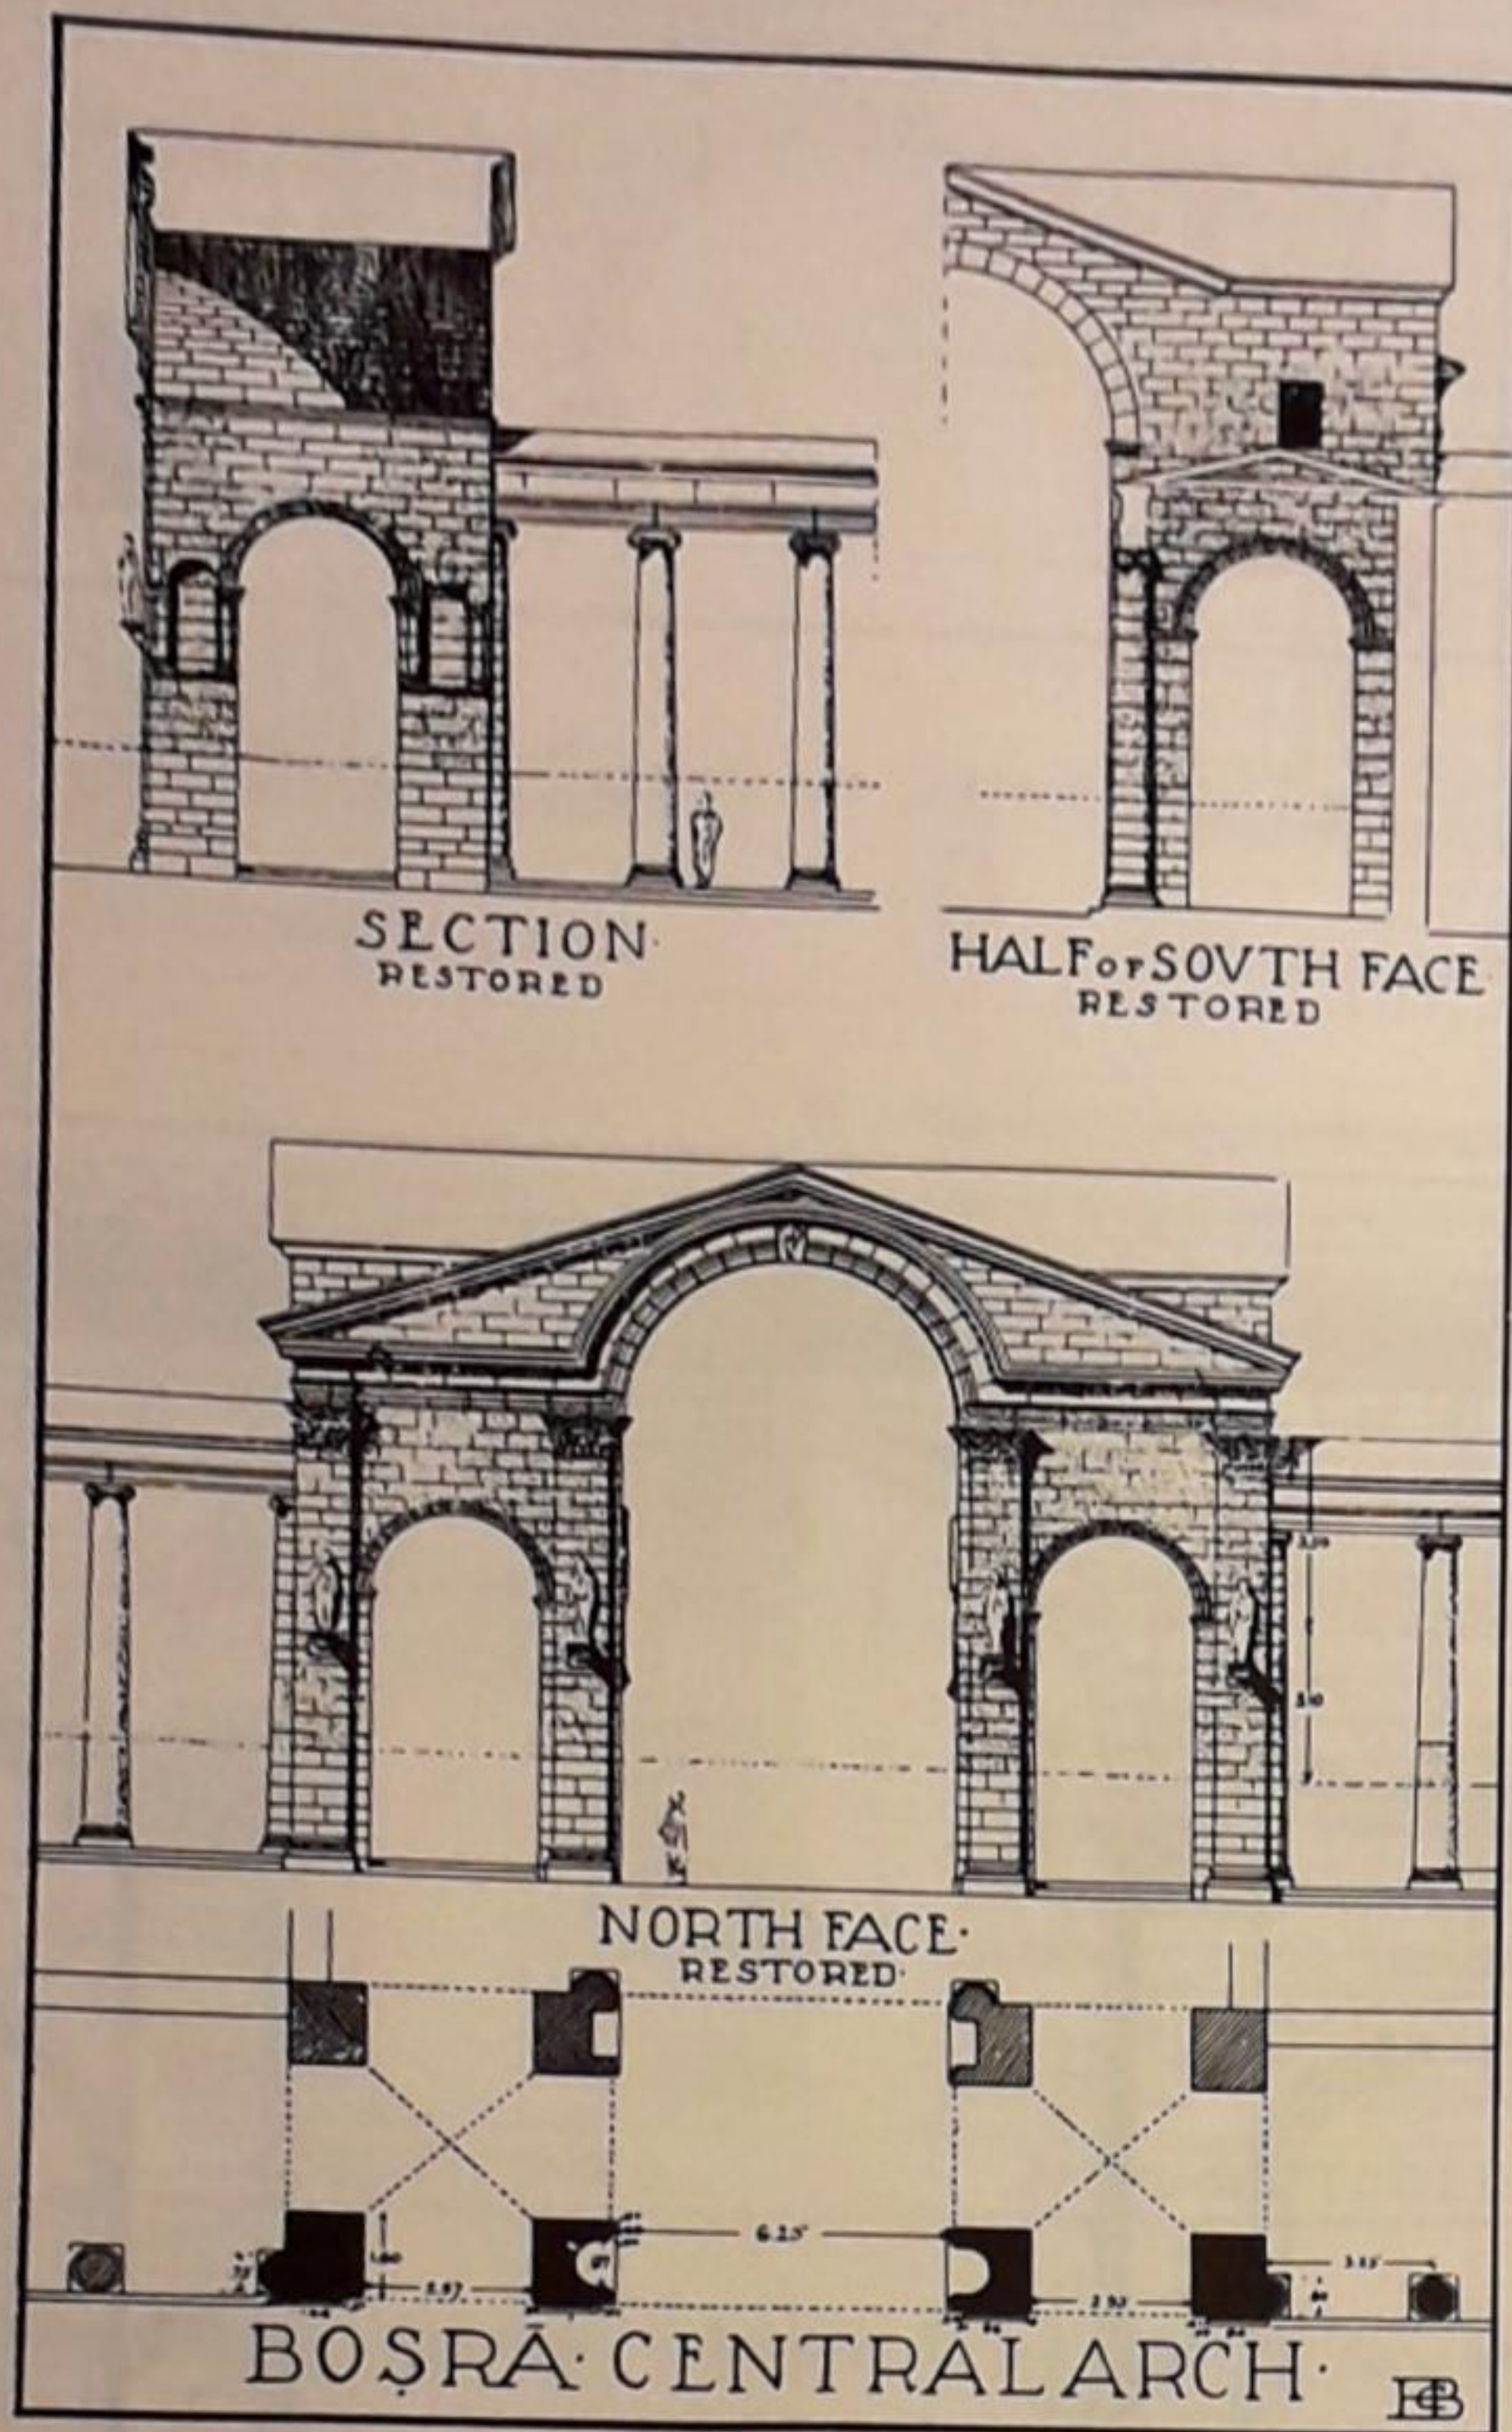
Bostra, the Central Triumphal Arch, proposed reconstruction.
